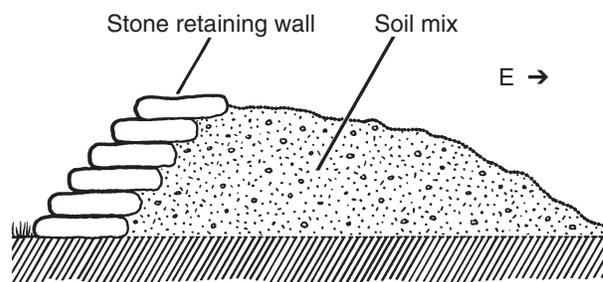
A retaining wall can be used to hold a mound of soil in place, providing a slope for the rock garden.
